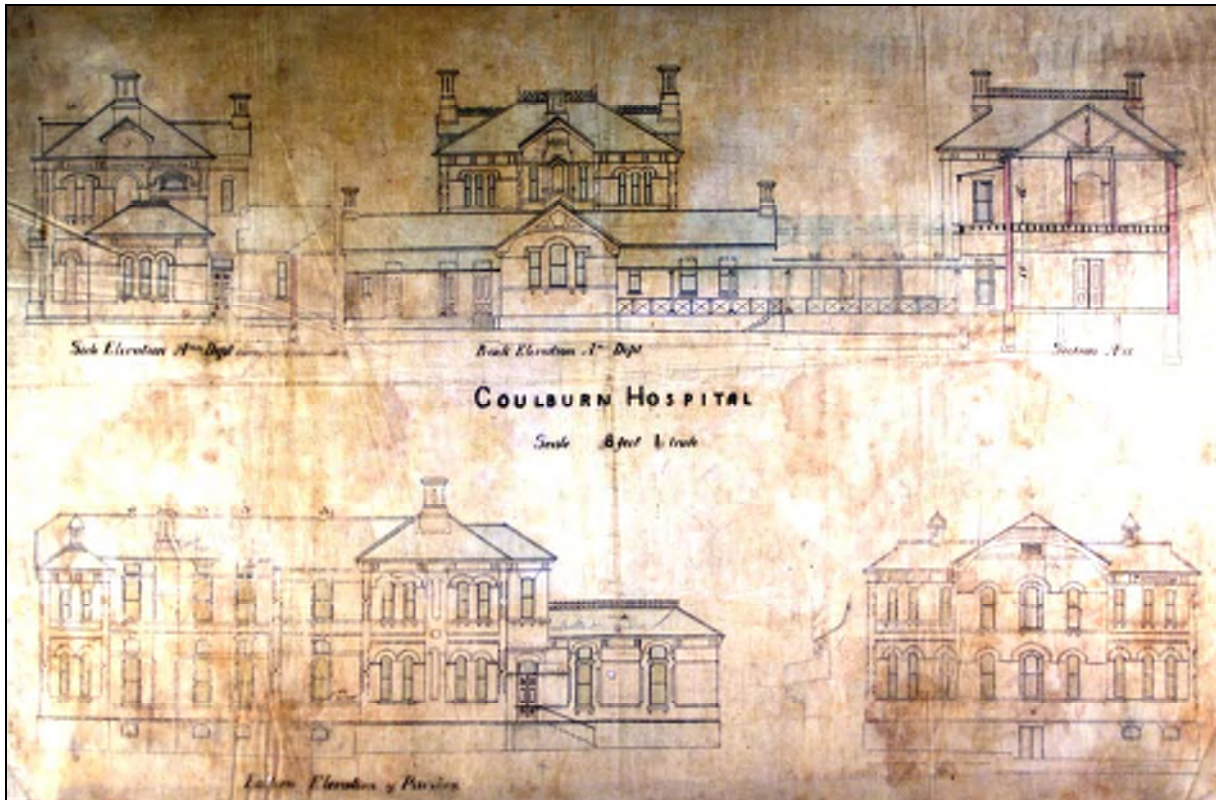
Undated elevations and section showing the two pavilions initially constructed. The elevation details appear to be as built. (Source: Goulburn & District Historical Society Inc, MC0178t)
